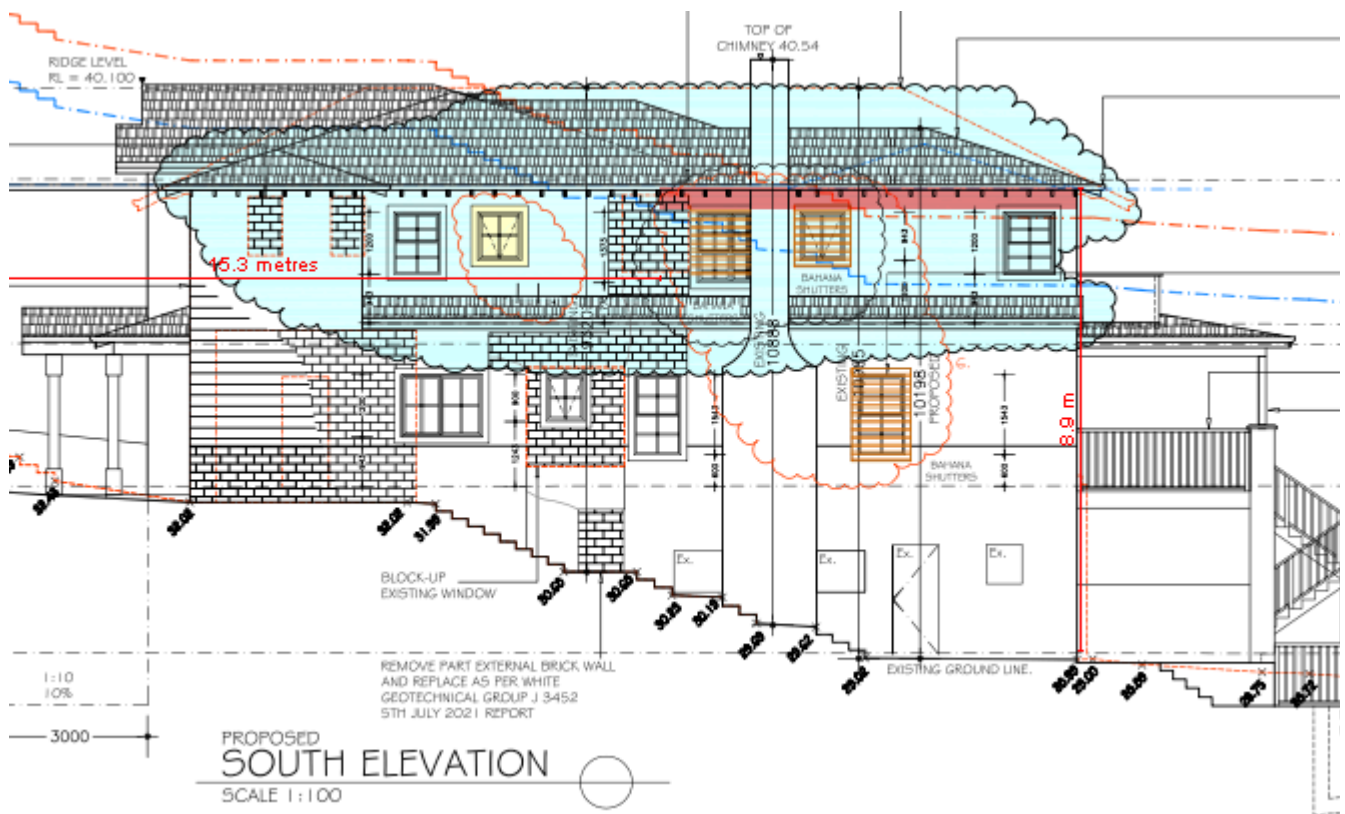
Proposed 400mm building height breach at the southern elevation shown shaded red.
